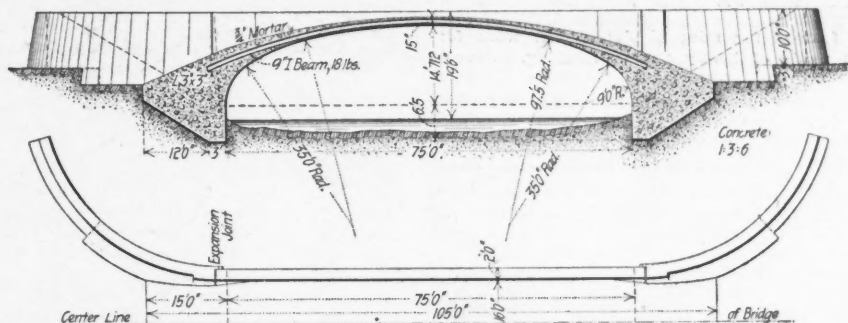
LONGITUDINAL SECTION OF SINGLE-SPAN MELAN ARCH.
